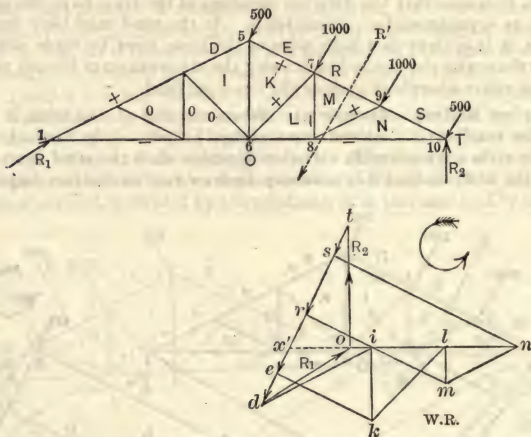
Triangular Truss. Truss-diagram and Stress-diagram, Wind Right
